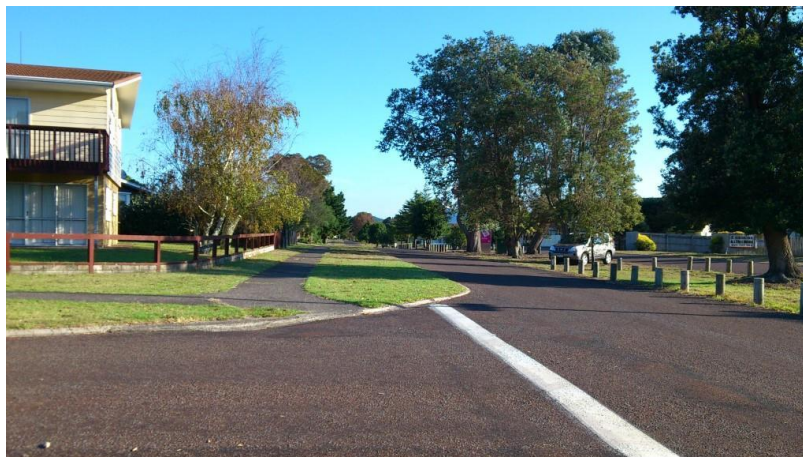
Old kerb ramp at Vista Paku/Pauanui Boulevard intersection
